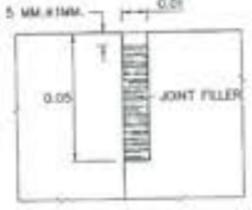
DETAIL OF JOINT BETWEEN CONCRETE PAVEMENT AND FLEXIBLE PAVEMENT
